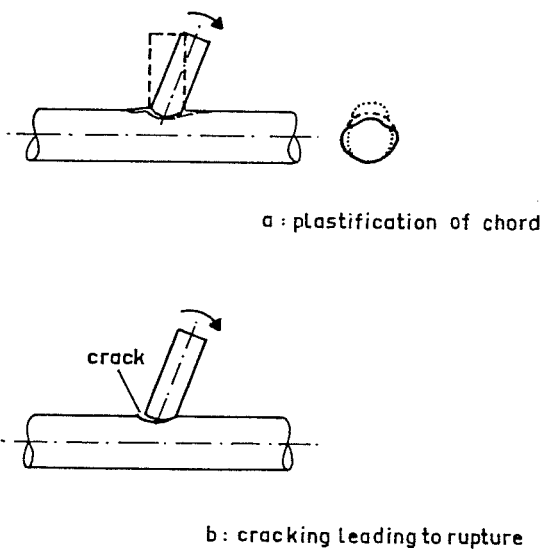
Typical Modes of Failure for Branch Bending Loads
